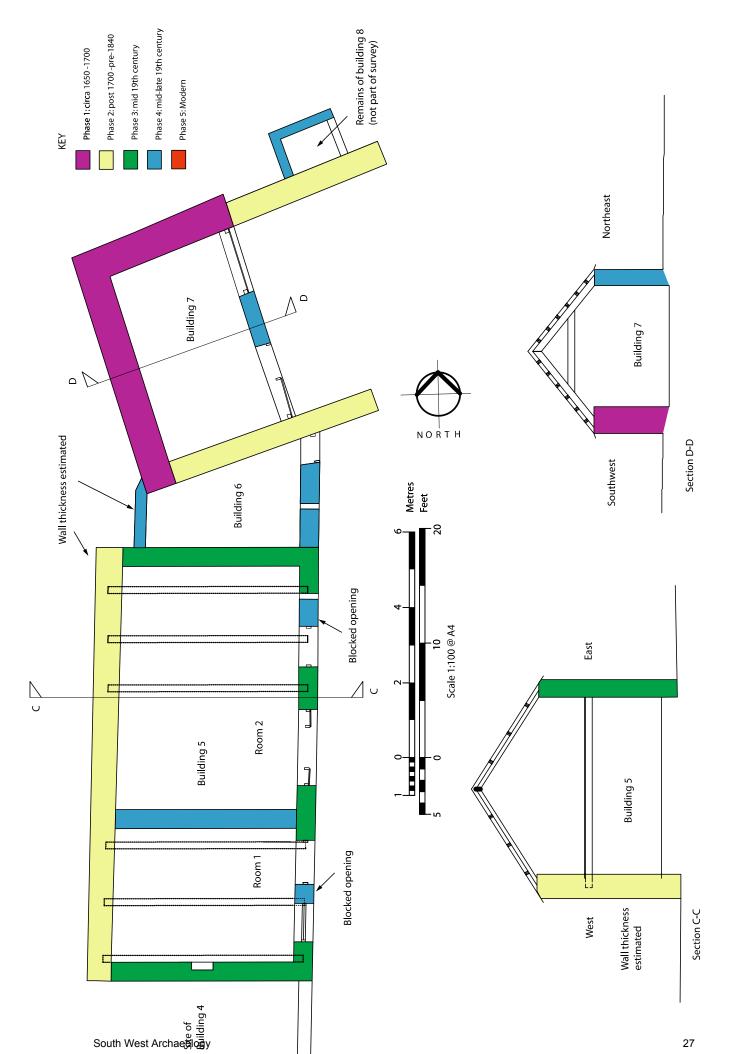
The Shippon and attached buildings (Buildings 5, 6 & 7), plans, cross-sections and phasing.
